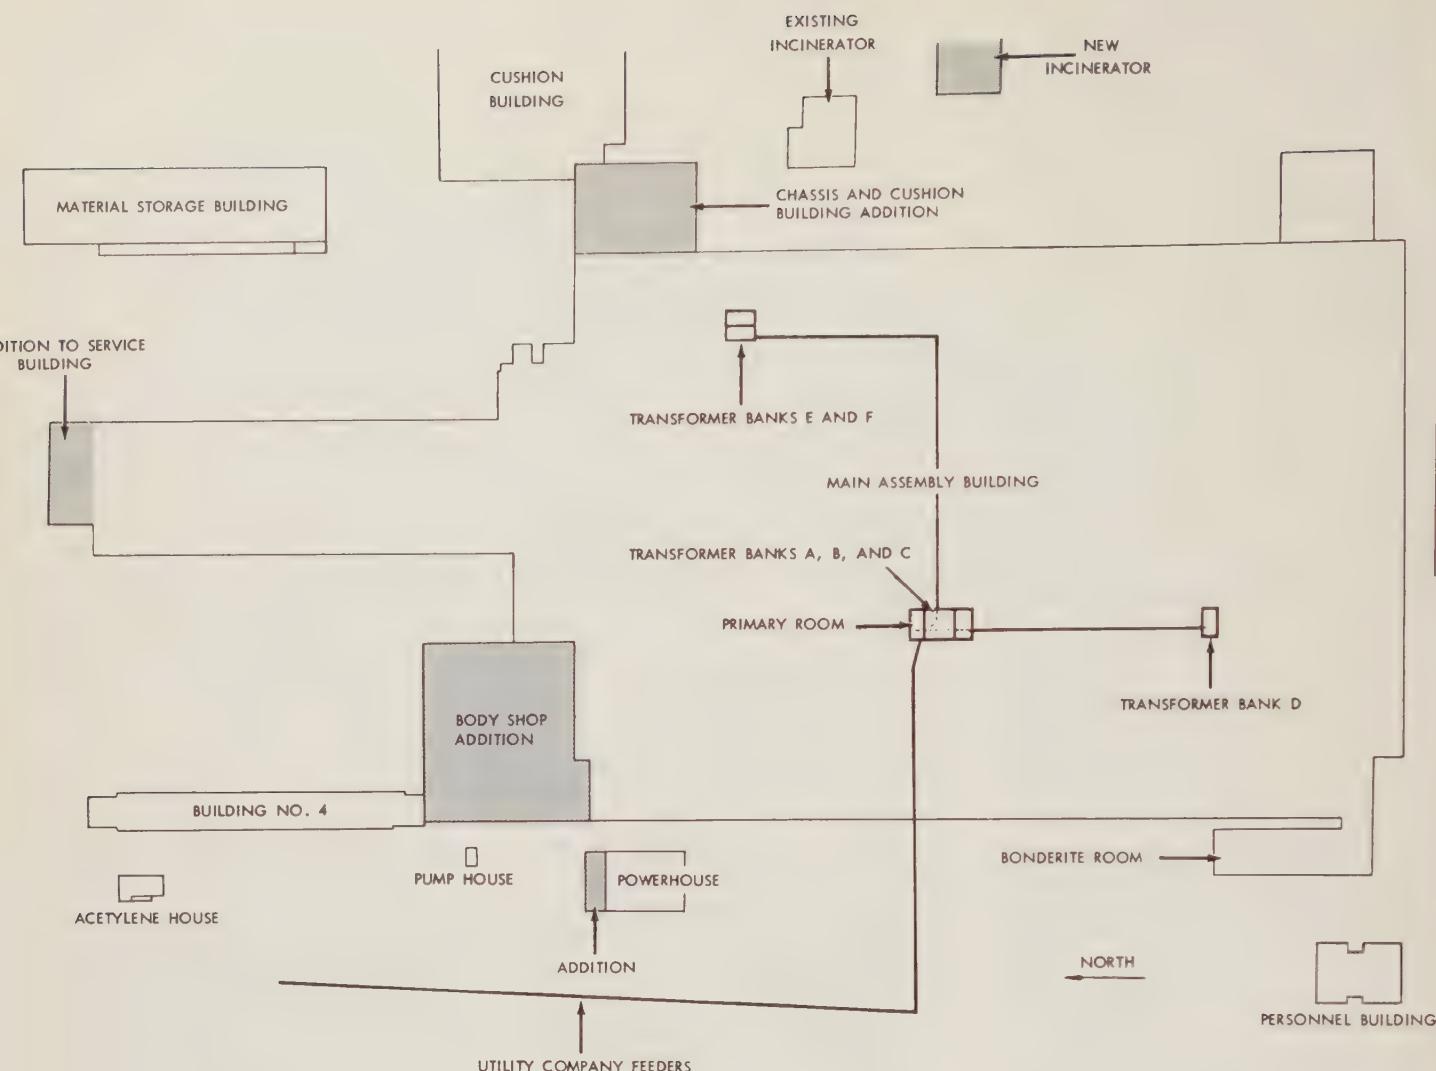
The layout of the electrical distribution system which existed prior to the study is shown on this plan view of the Linden Plant. When the plant was first opened in 1937, it was served by transformer Banks B, C, and D. Bank A was added in 1941. Banks E and F were added in 1955 and later were to become a part of the revised system. The building additions which figured
